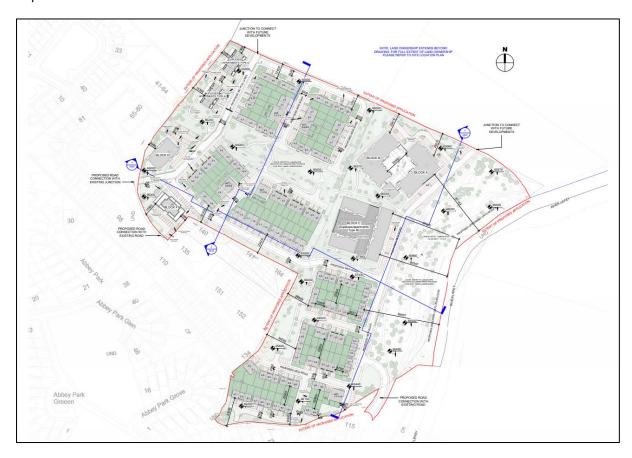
Site layout plan of proposed development of 333 no. residential dwellings.
